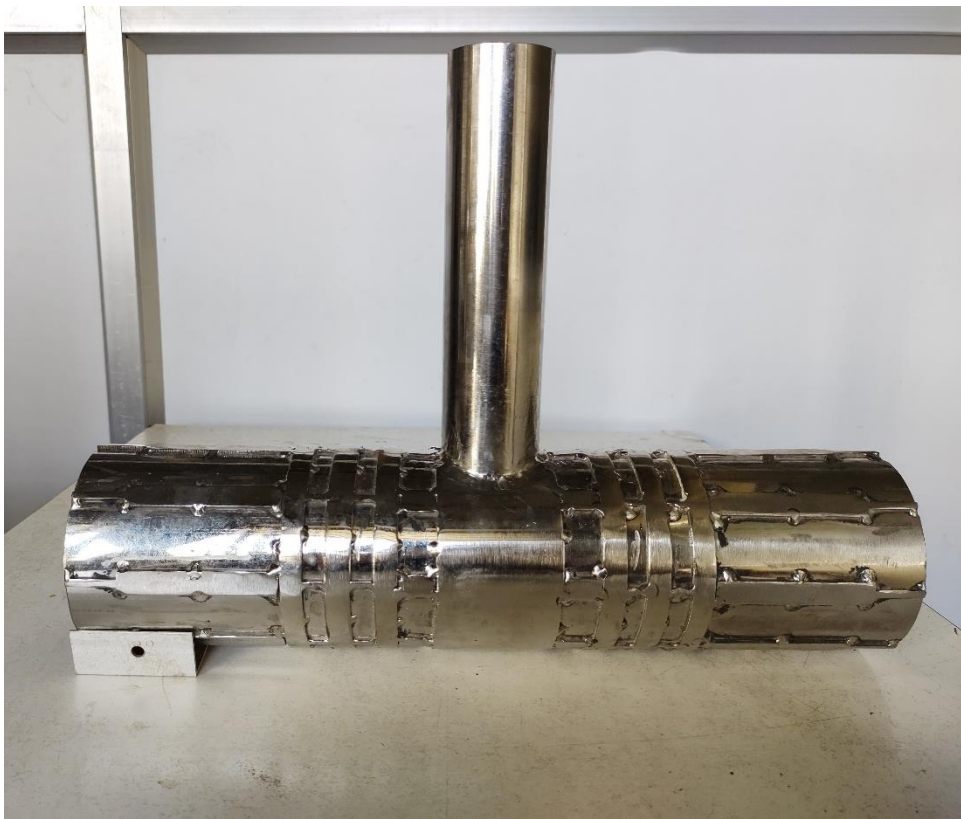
Reinforced tubular T-joint Can -Ring- 6 strips
